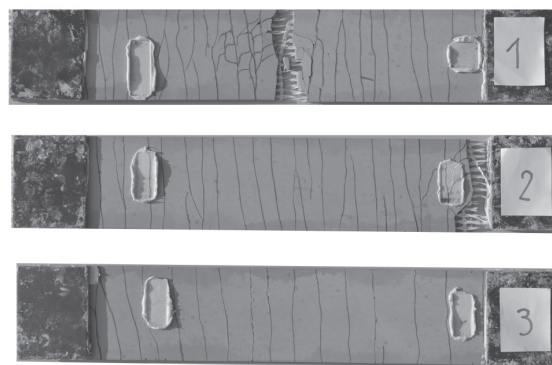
Crack pattern TRM reinforced with 1 layer F3
